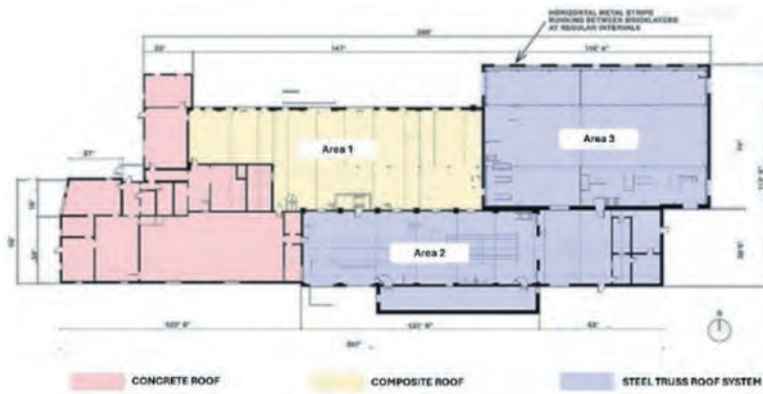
Sand Spring power plant- existing plan, graphical representation (Plan view by owner).
